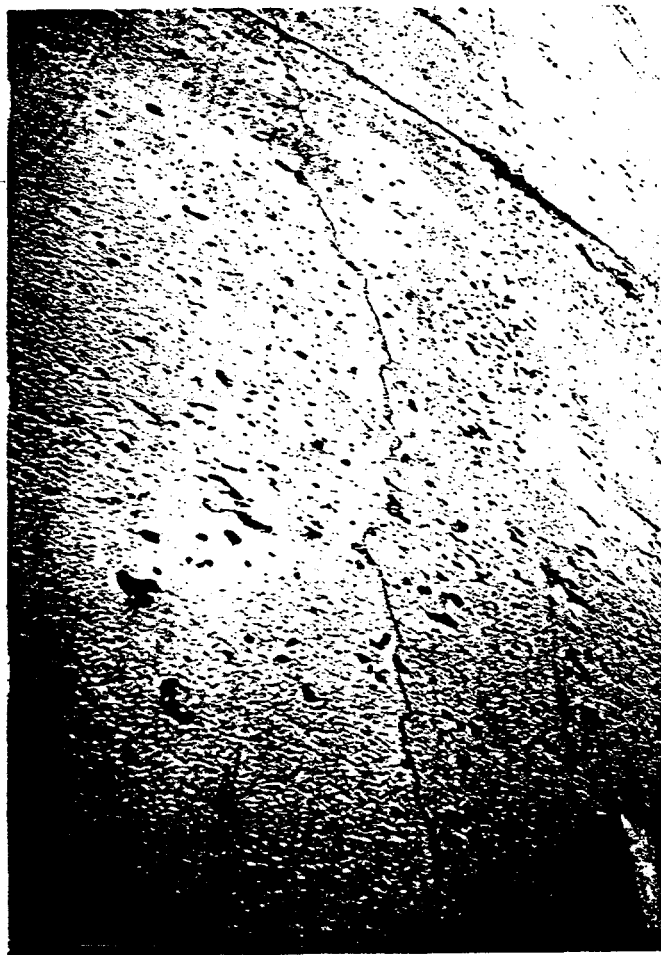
Typical condition of concrete column on north quadrant above monitoring platform. Stress crack runs to the top of the chimney.
